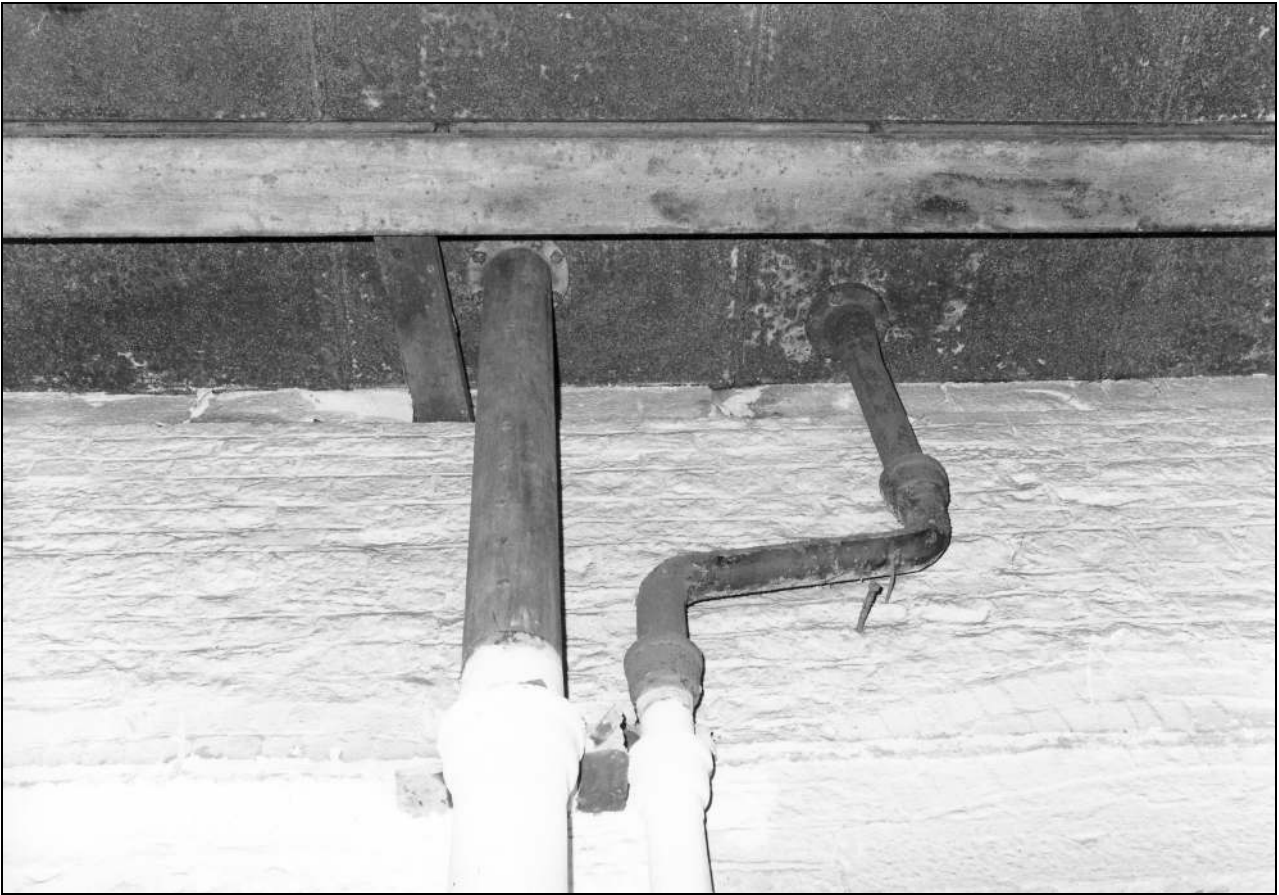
Bay 4: pipes in west side, at base of tank (overflow and later feed, nos 1 & 2) (film 4, frame 4)
